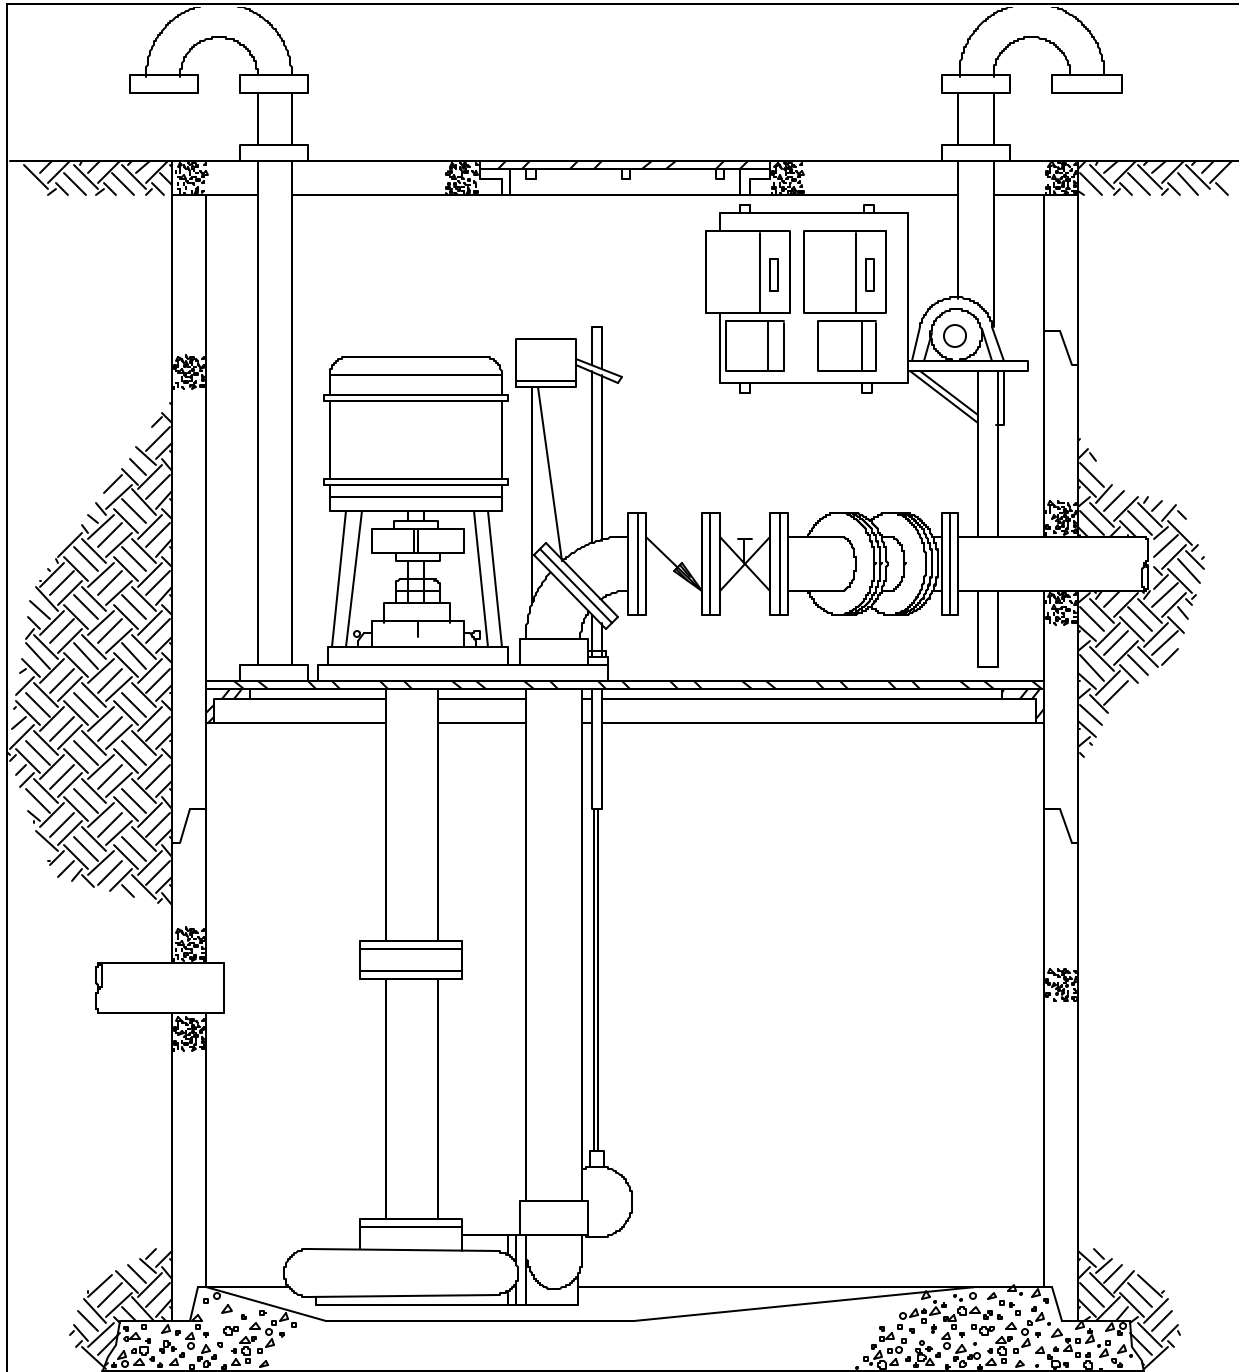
Lift station with wet pit vertical centrifugal pump
